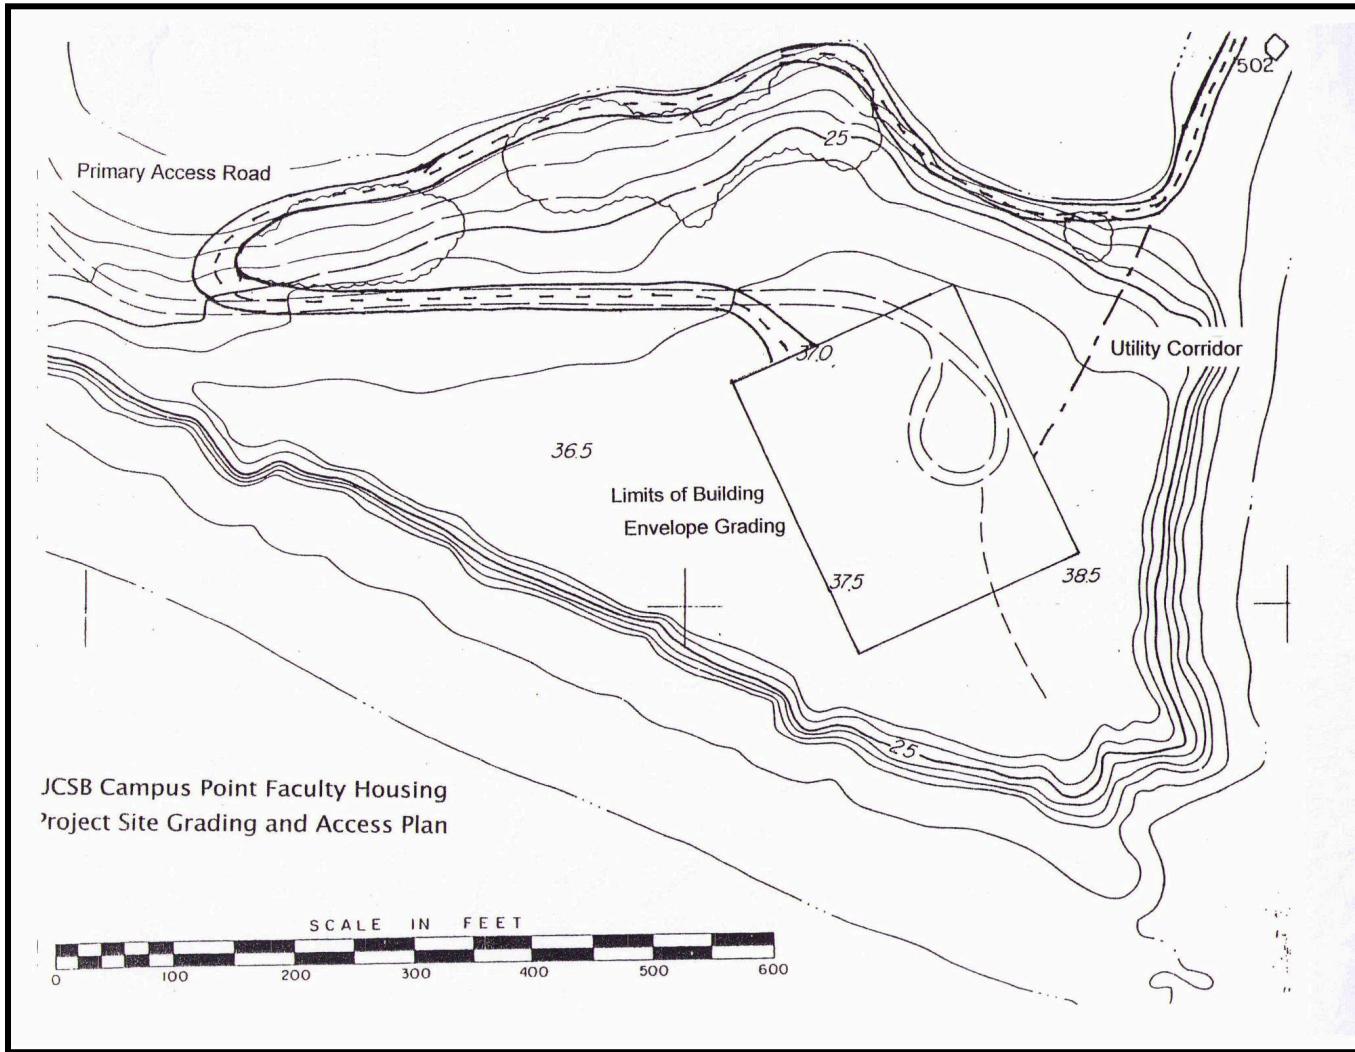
UCSB Goleta Point Faculty Housing Project Site Grading and Access Plan
